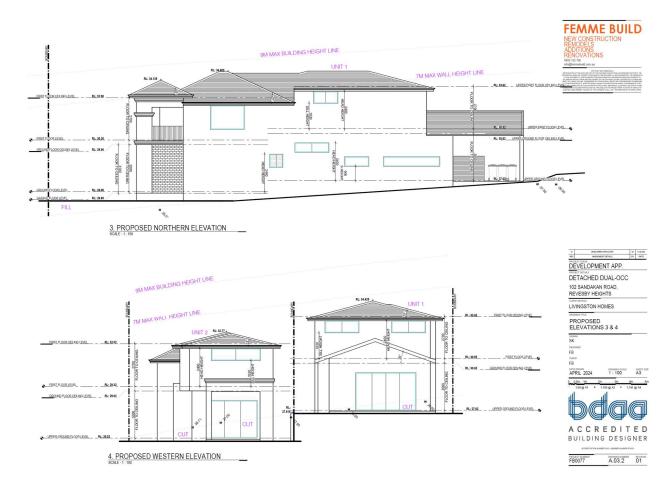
Proposed Northern & Western Elevation (Source: Femme Build)
